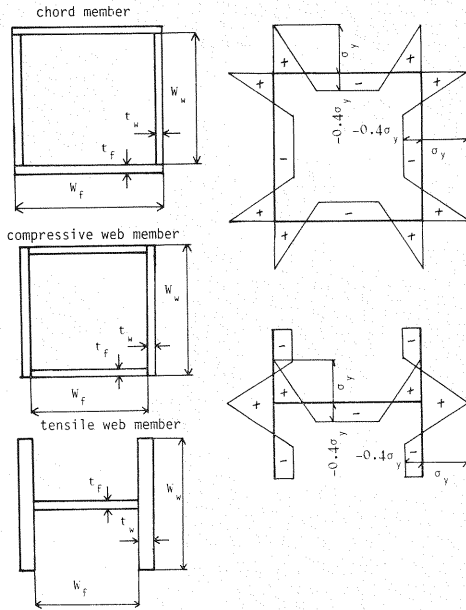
Cross sectional shapes of members and distribution of residual stresses.
